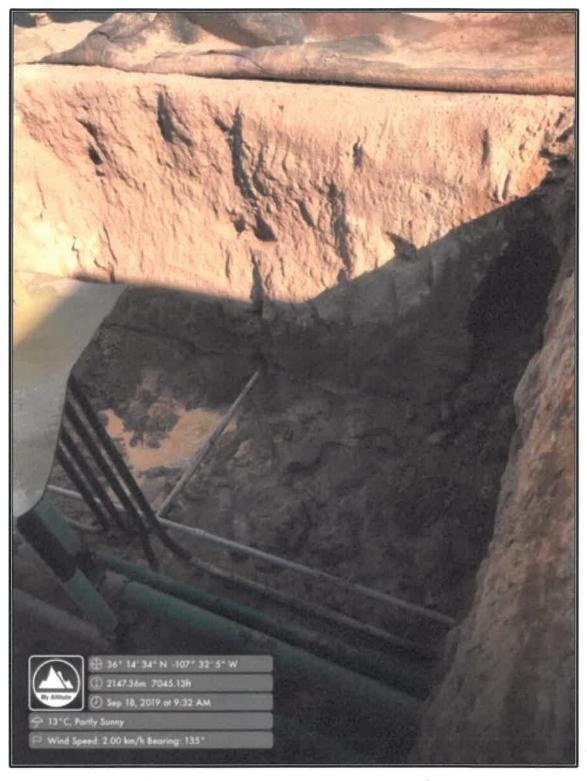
Excavated Area on 9/18/2019 (View of North Wall)
